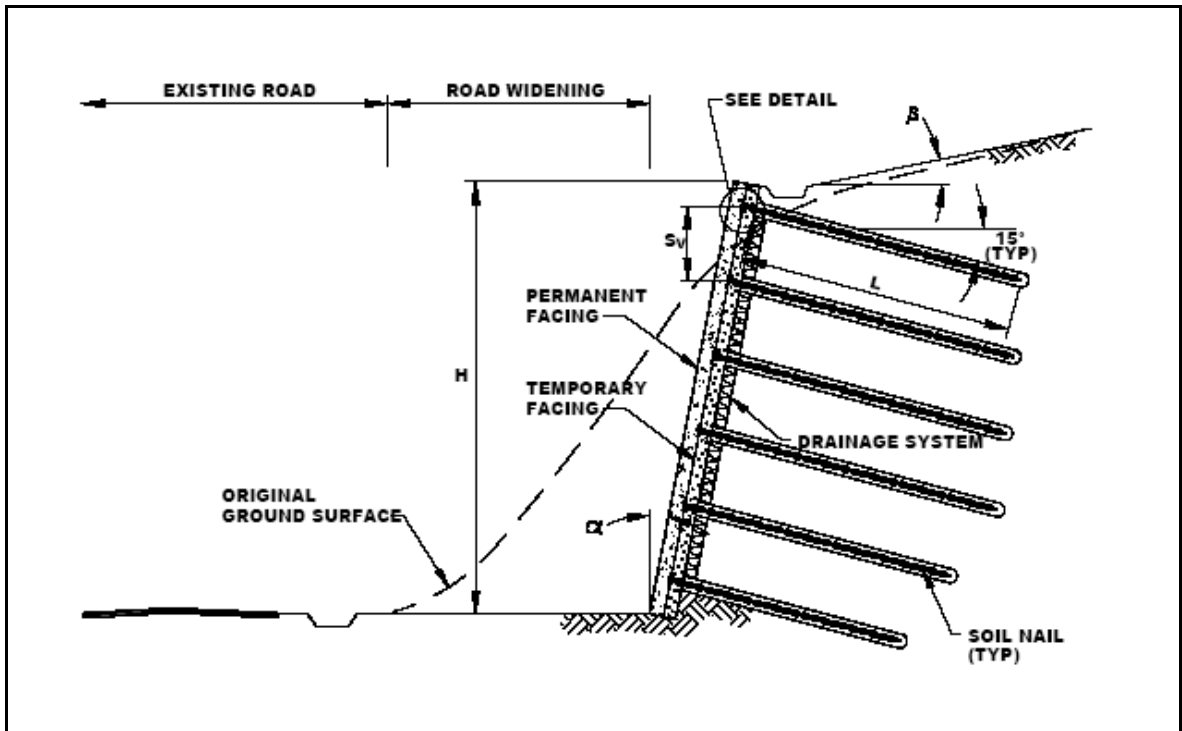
Typical cross-section of a soil nail wall (FHWA, 2003)
